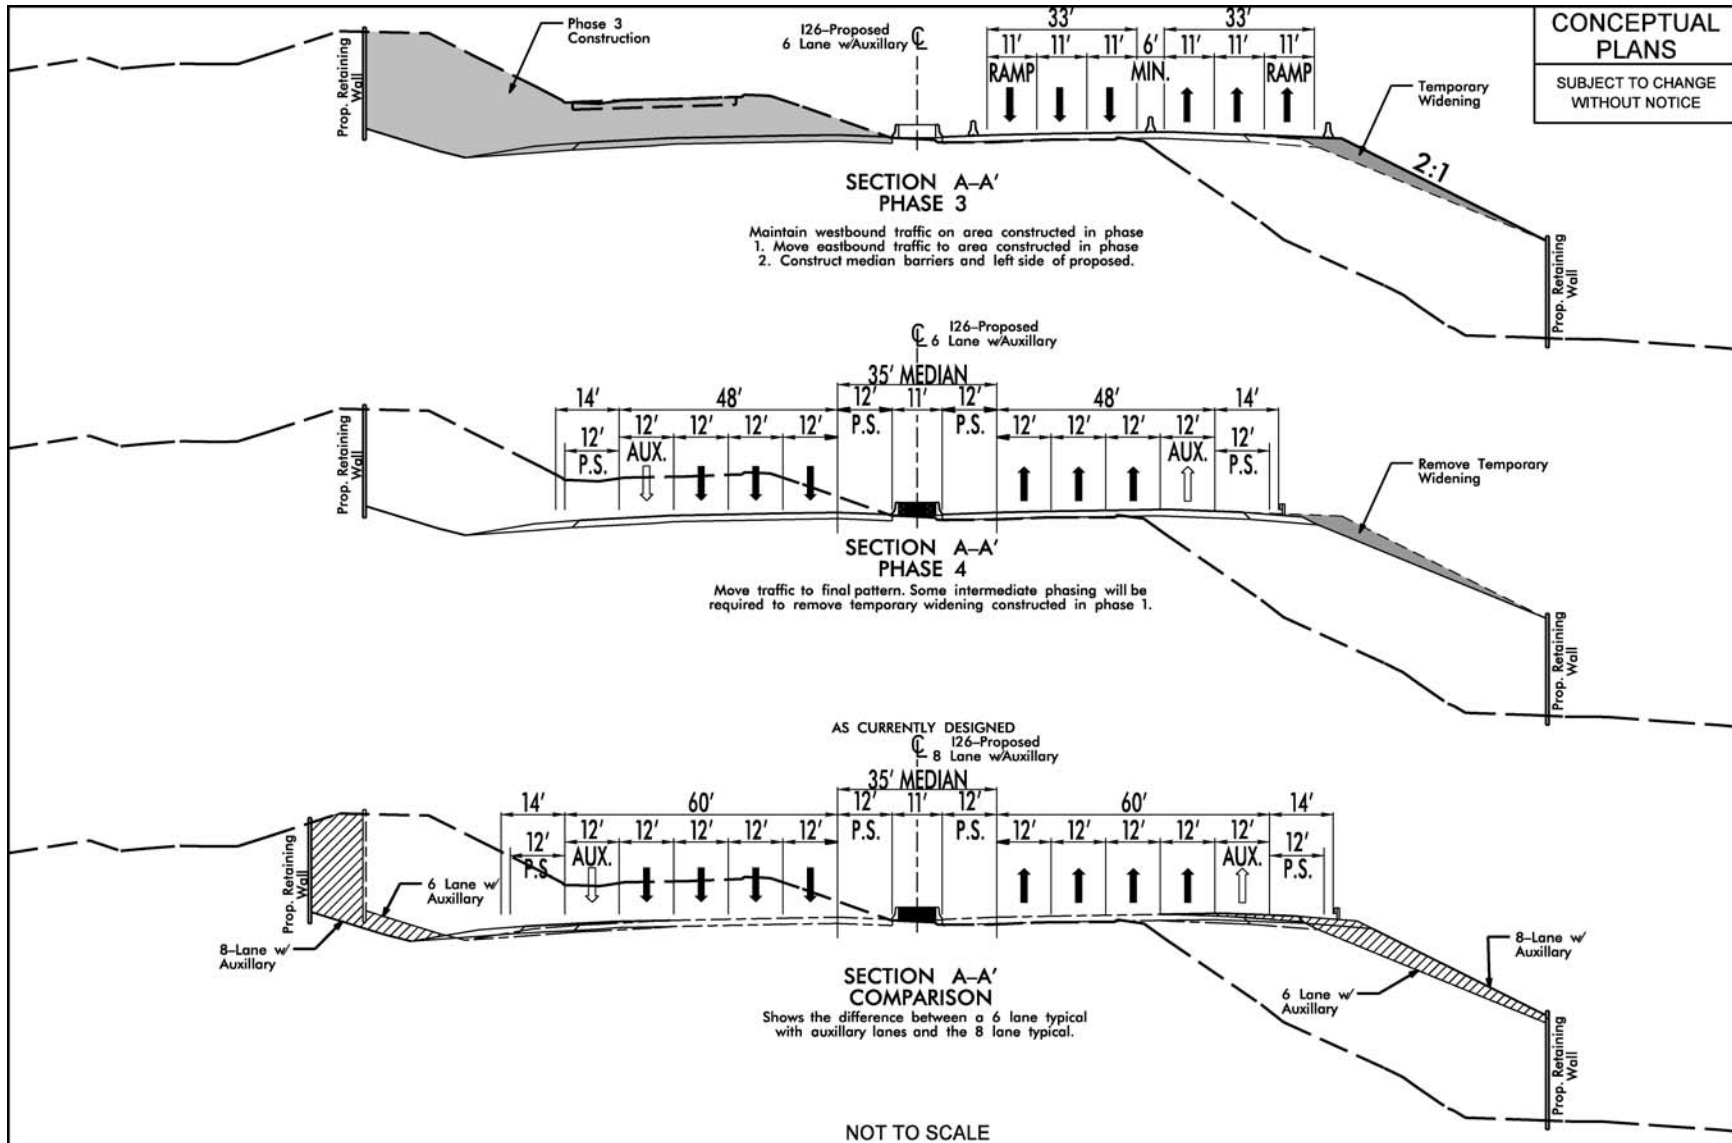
Phase Construction Concepts – South of bridge over State Street
